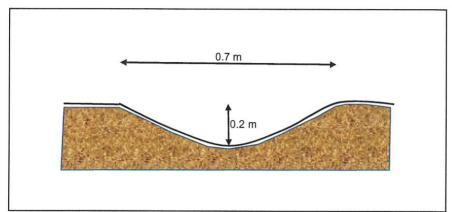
Typical Shallow Swale Drain Cross-section to be used on this Site
